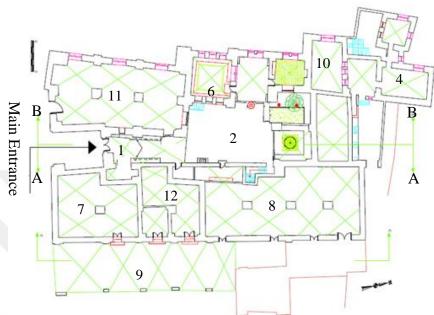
First floor plan of Nemr Palace (Kanaan, 2010)
